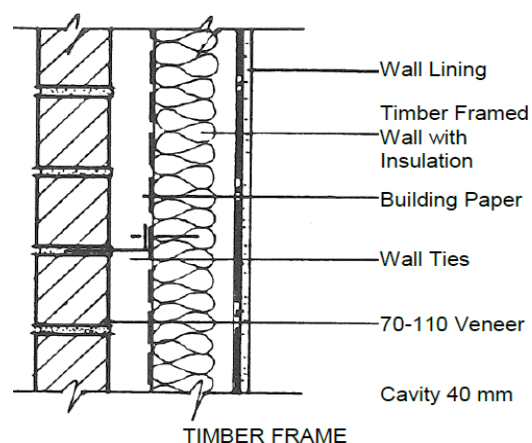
Modern Positioning of veneer tie detail (New Zealand Concrete Masonry Association Inc., 2010)
